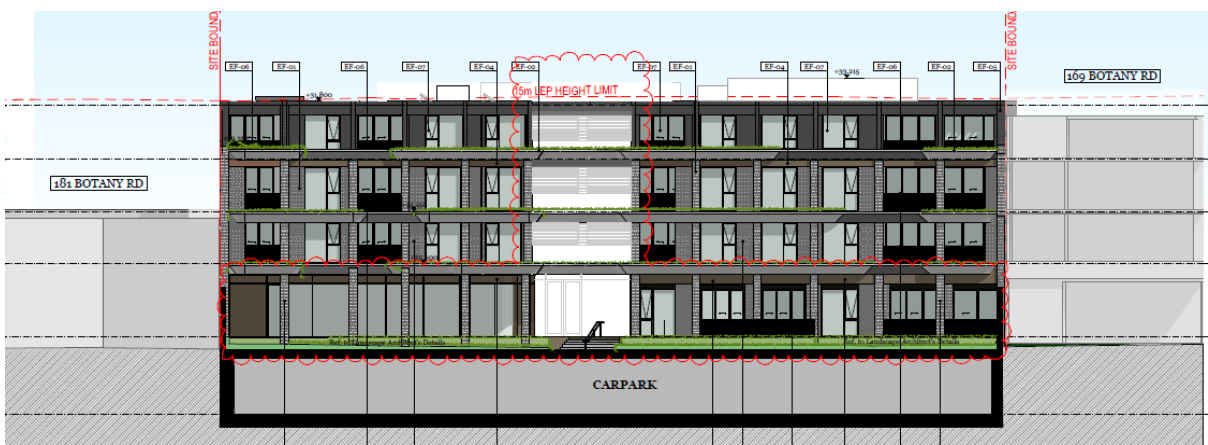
Proposed internal elevation looking towards Building A (fronting Botany Road)
